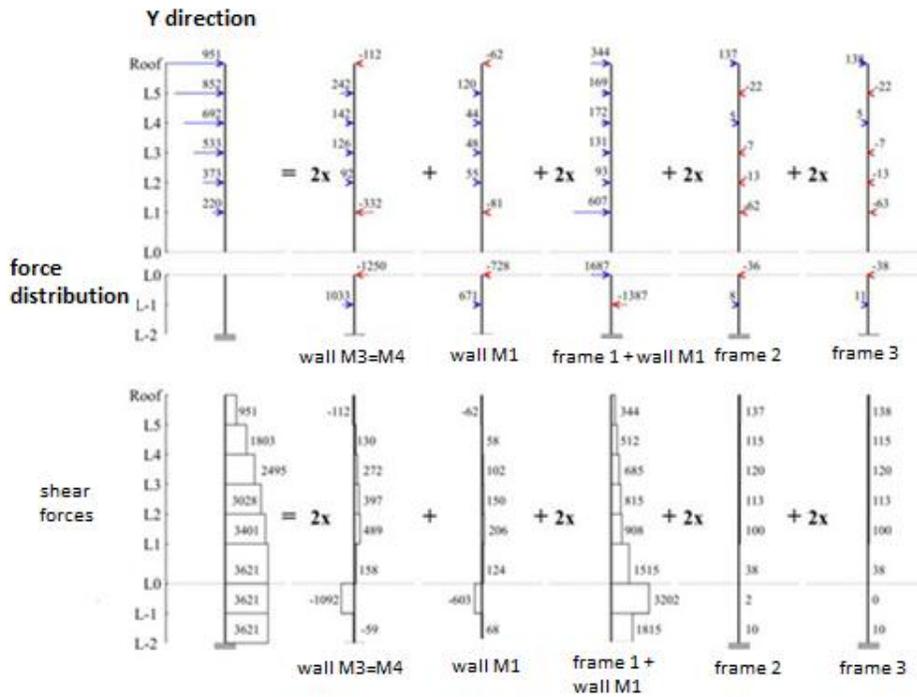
The distribution of horizontal forces and shear forces for each frame and walls in the direction Y.
